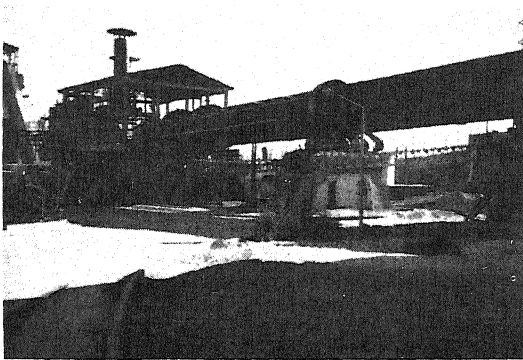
Settlement of the Lowshan cement factory kiln's foundation
